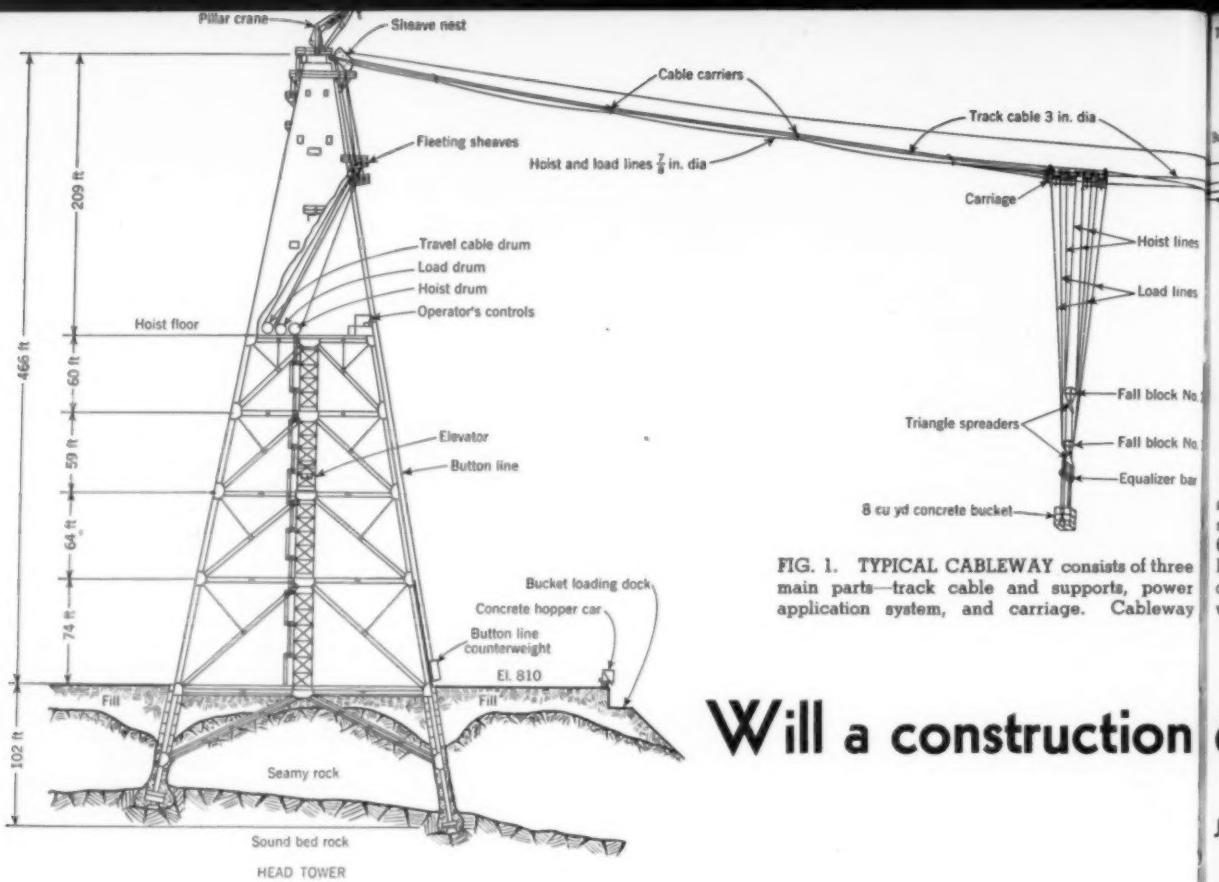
TYPICAL CABLEWAY consists of three main parts—track cable and supports, power application system, and carriage. Cableway
